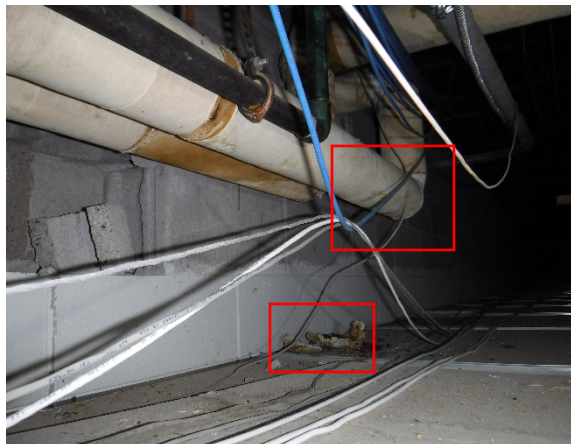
Example Photo of Poor Condition, Damaged ACM Piping Insulation with Debris on Ceiling Tile, Fitting – Hallway (SW), Ceiling Cavity.
